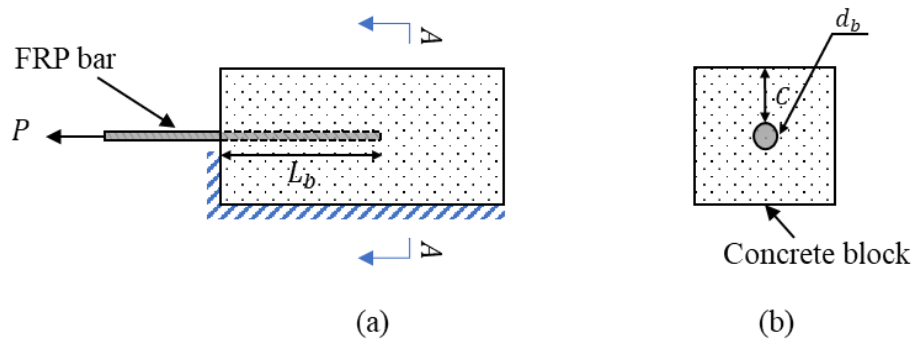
Pull-out test setup: (a) side view; (b) front view
